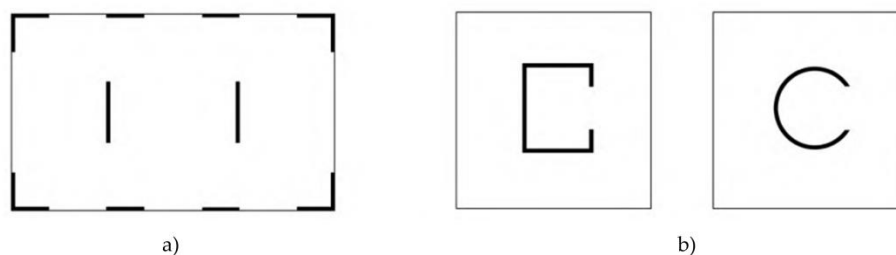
a) Shear truss / Shear wall system b) Cores [4]
